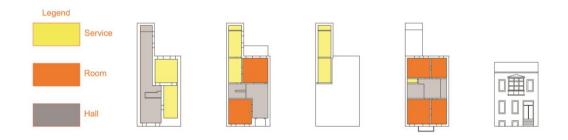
The base sample of the two-story İzmir Houses with plan type 1
